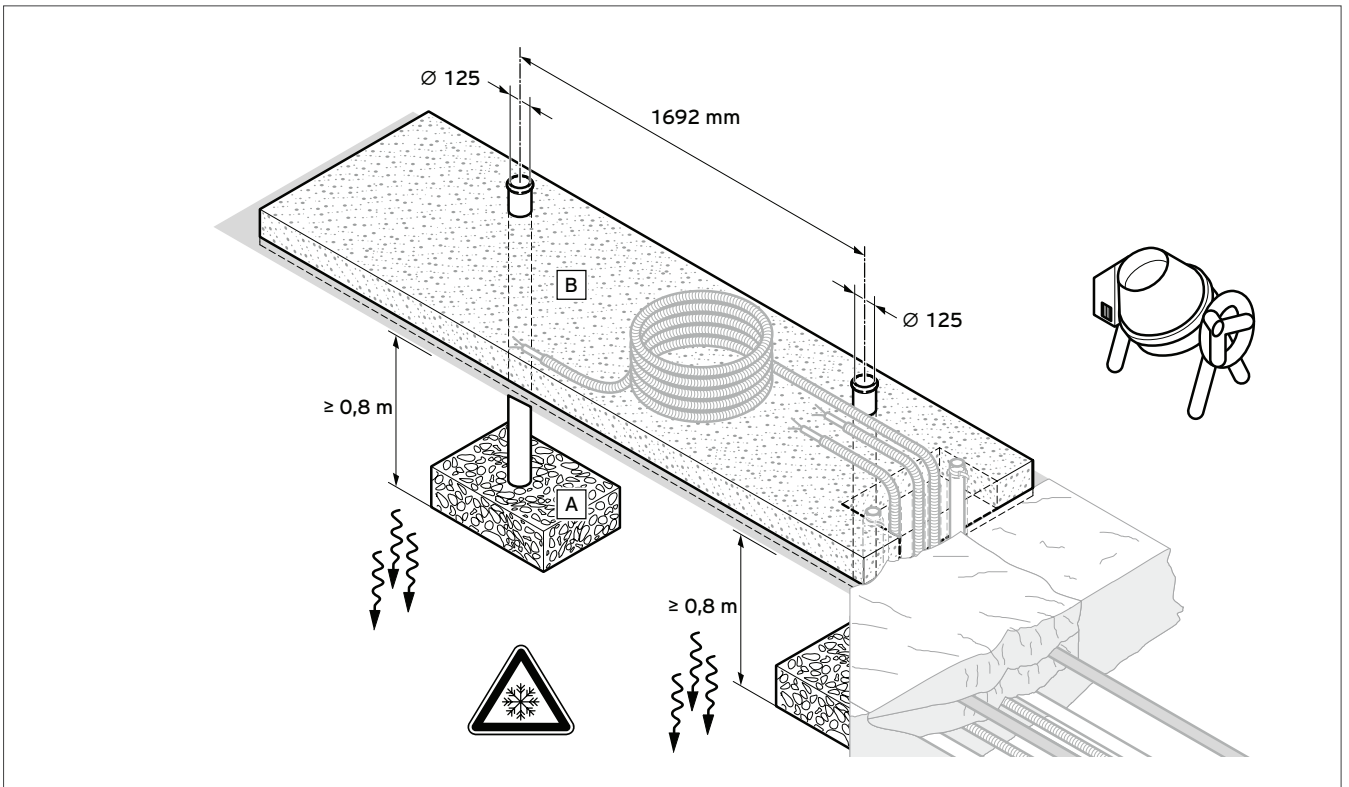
Foundation plan for two aroCOLLECT outdoor units
